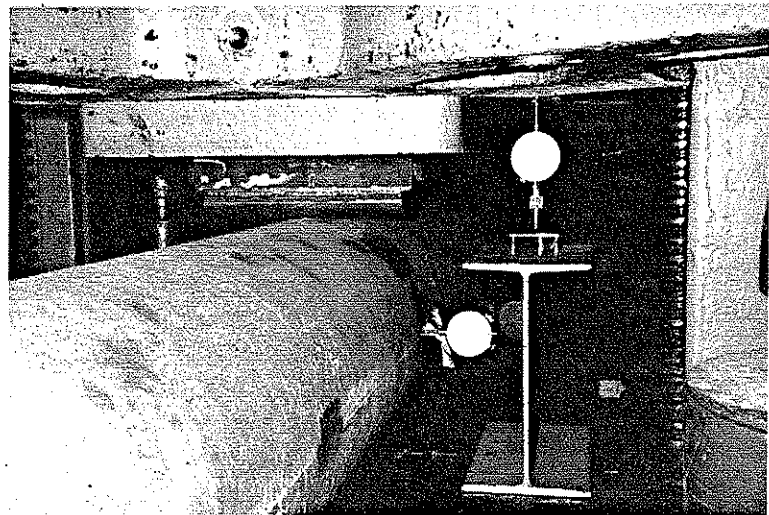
Overall View of Denting in the 800-kip Machine.
